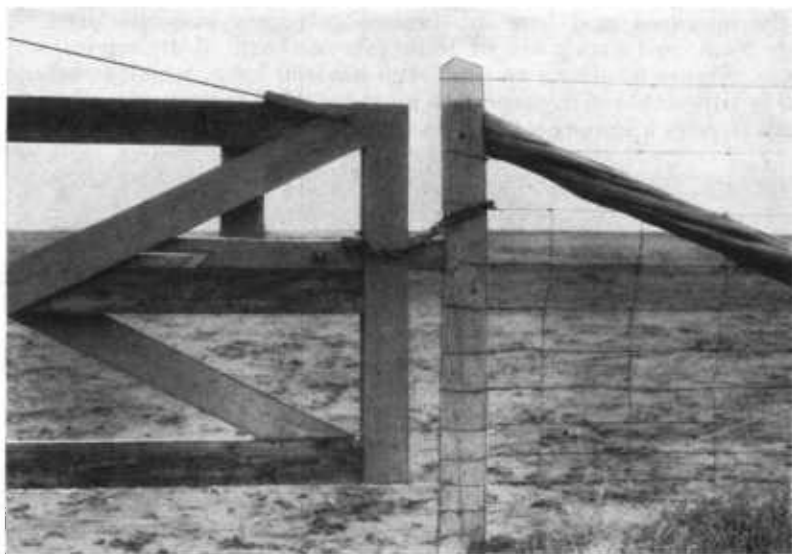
A sliding gate latch notched to make it stock proof. Padlock and chain prevent theft of stock.
